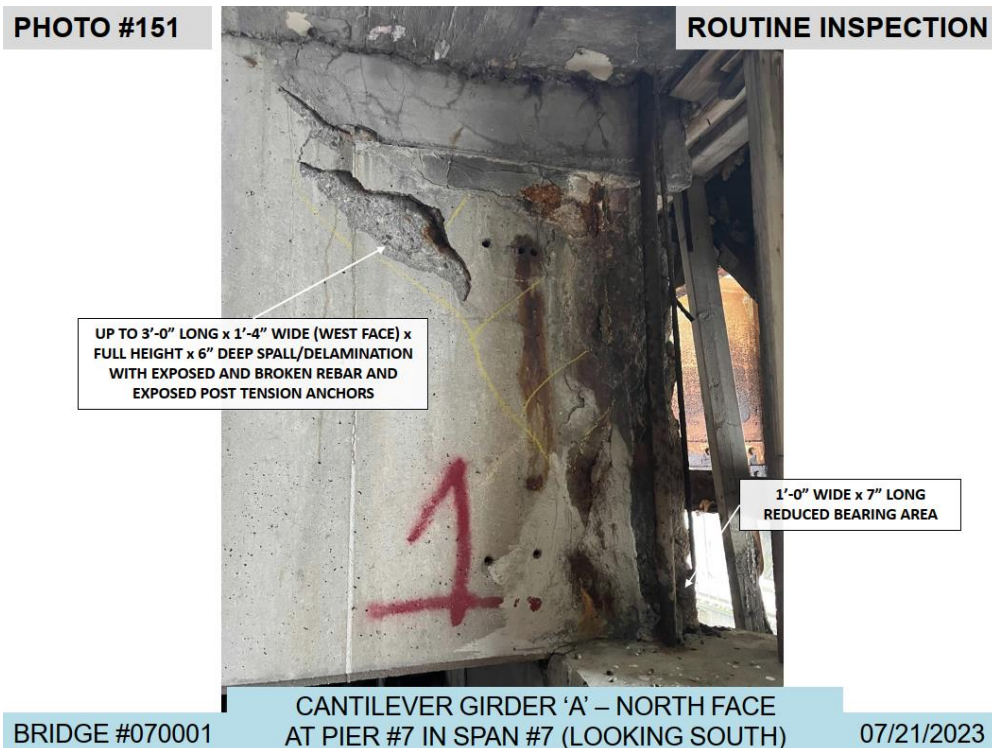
Inspection photo of exterior tie-down rod for cantilever beam A at Pier 7 taken July 2023 (AECOM).
